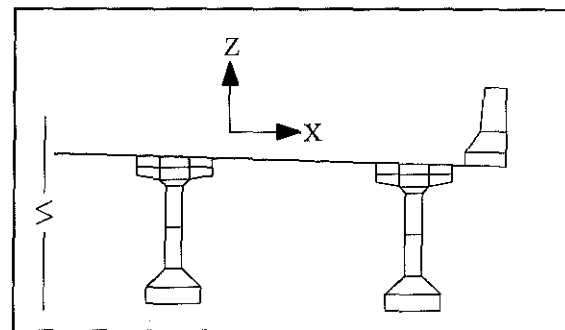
Cross Section of the Northbound Bridge Finite Element Model.
